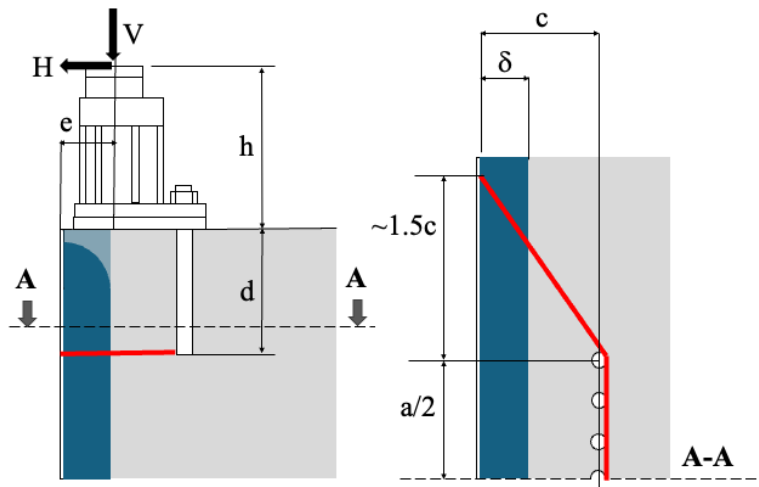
Concrete edge failure (red) and in-service irradiation damage (blue).
